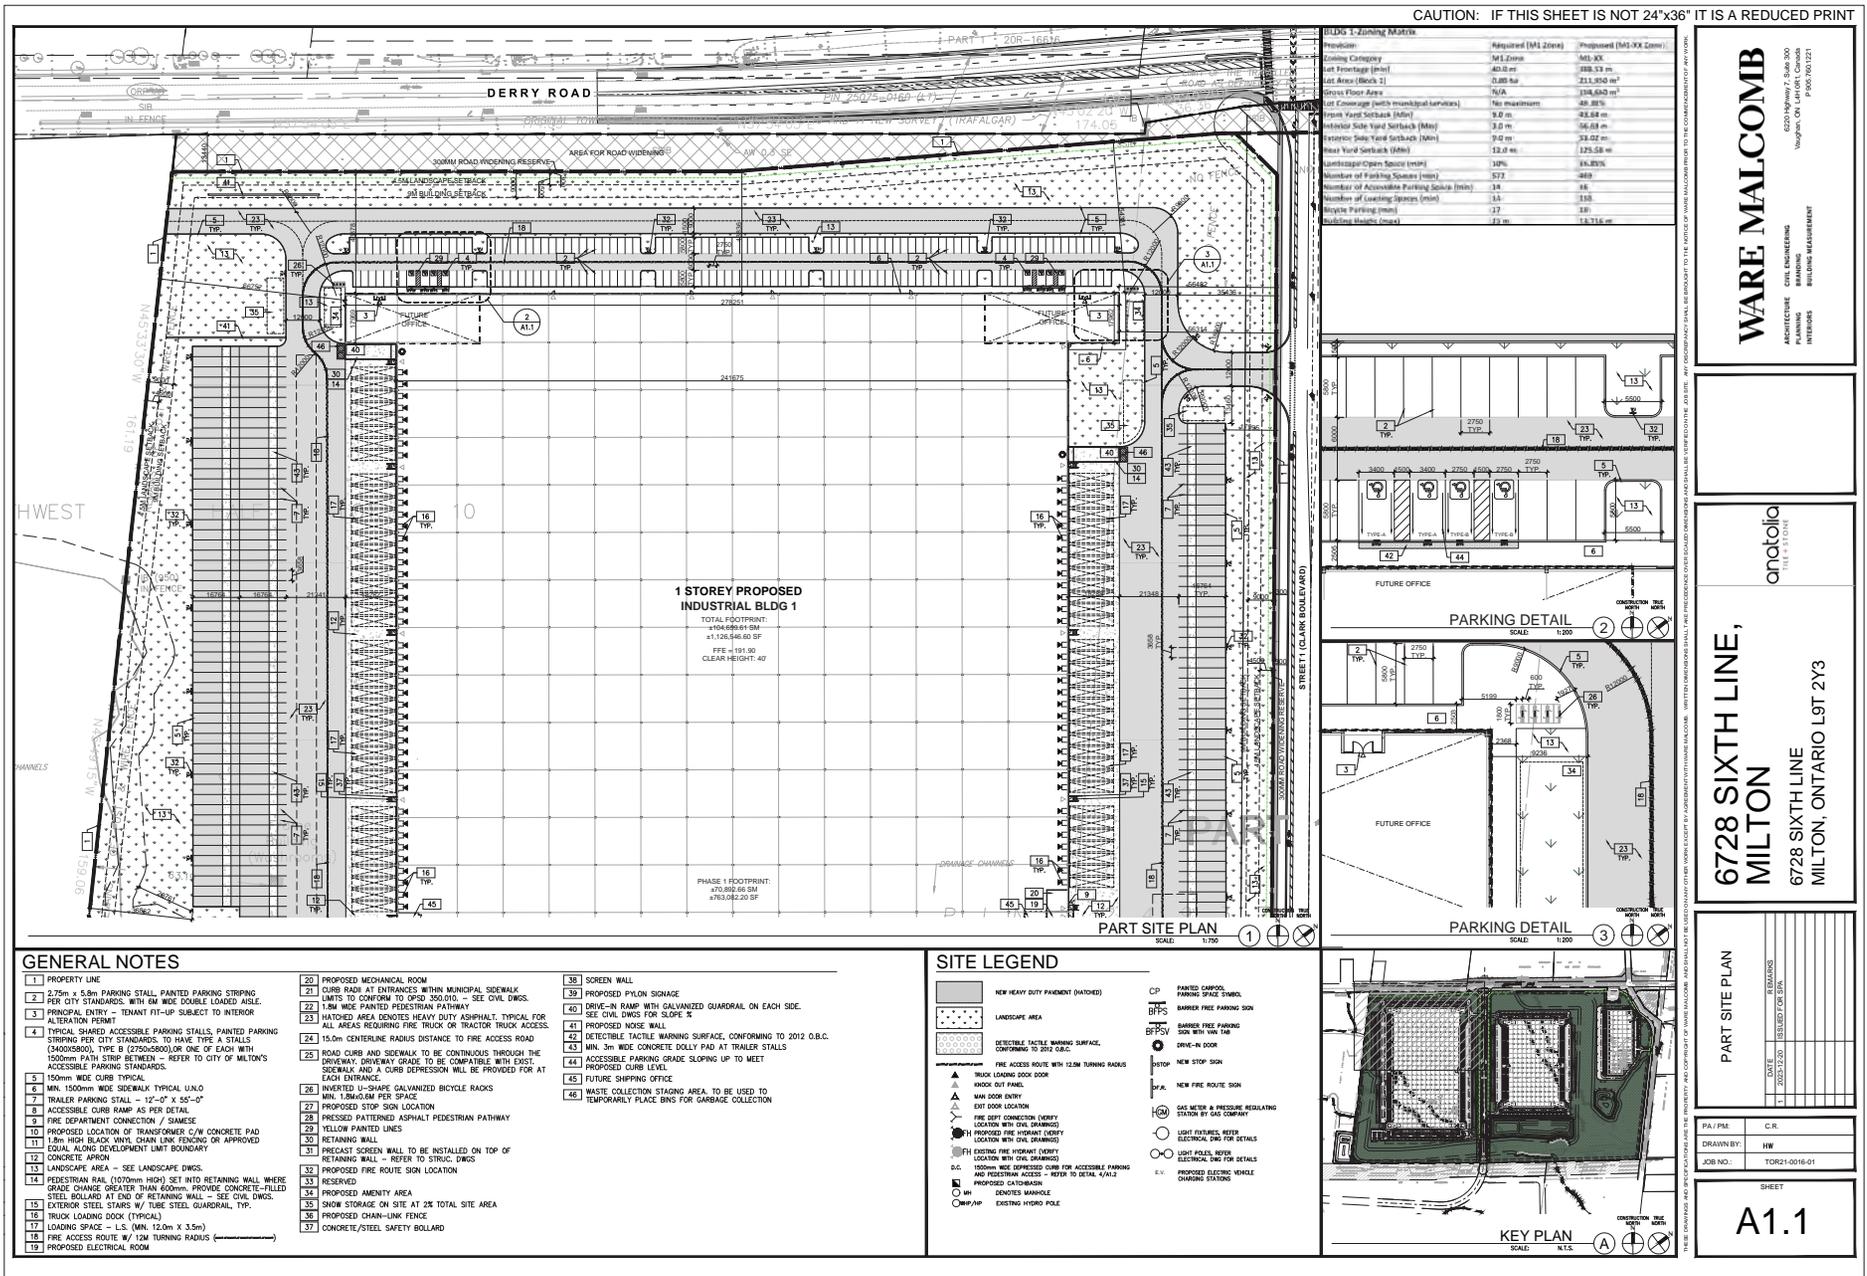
Proposed Site Plan, prepared by Ware Malcomb.
